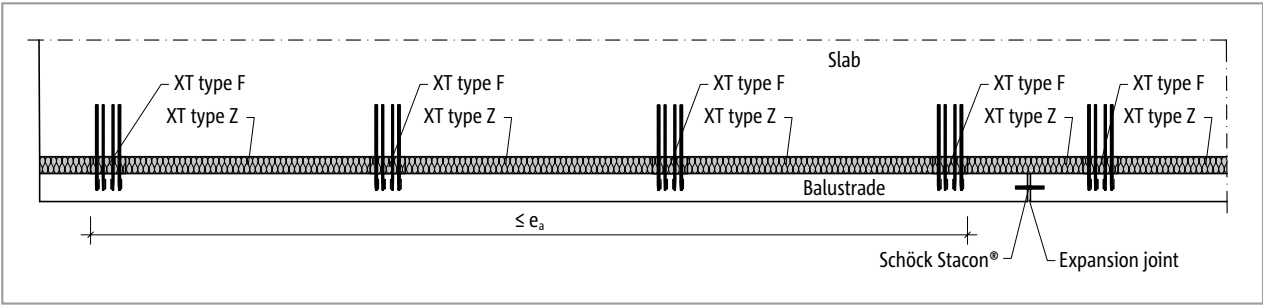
Schöck Isokorb® XT type F: Expansion joint arrangement
